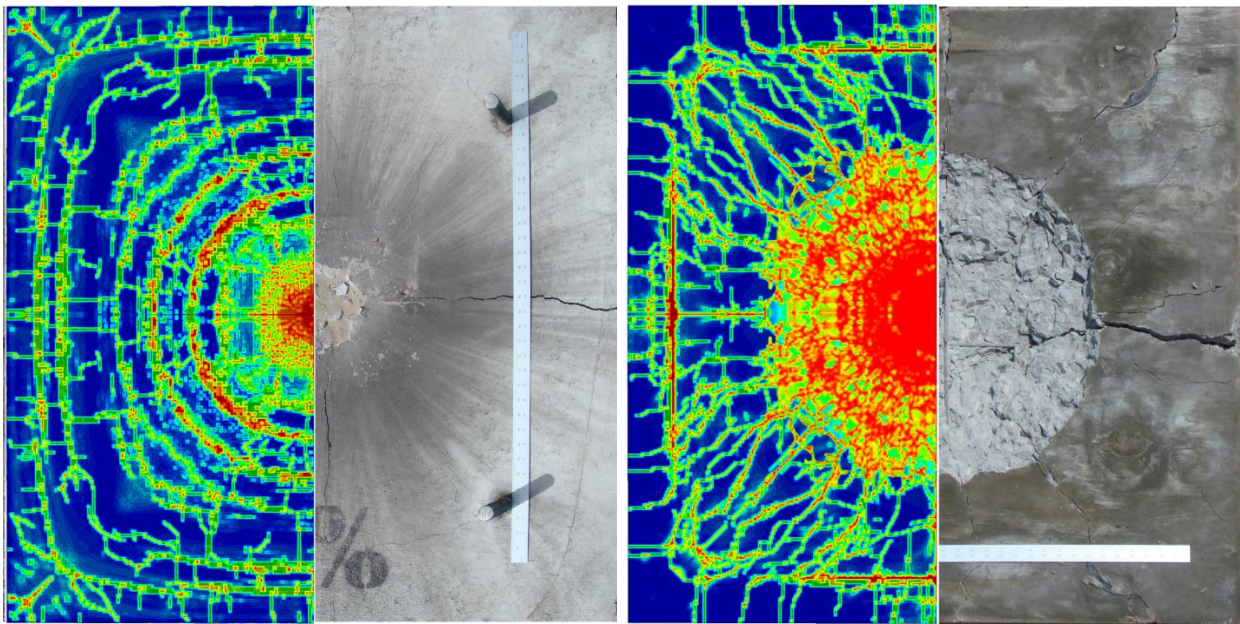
Damage comparison of suspended reinforced concrete slab (Front: left; back: right)
